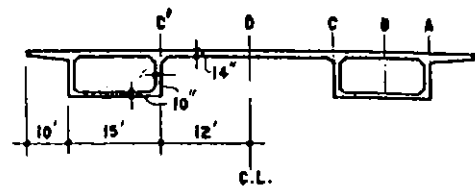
Twin-box-section deck with the boxes interconnected by the top slab
